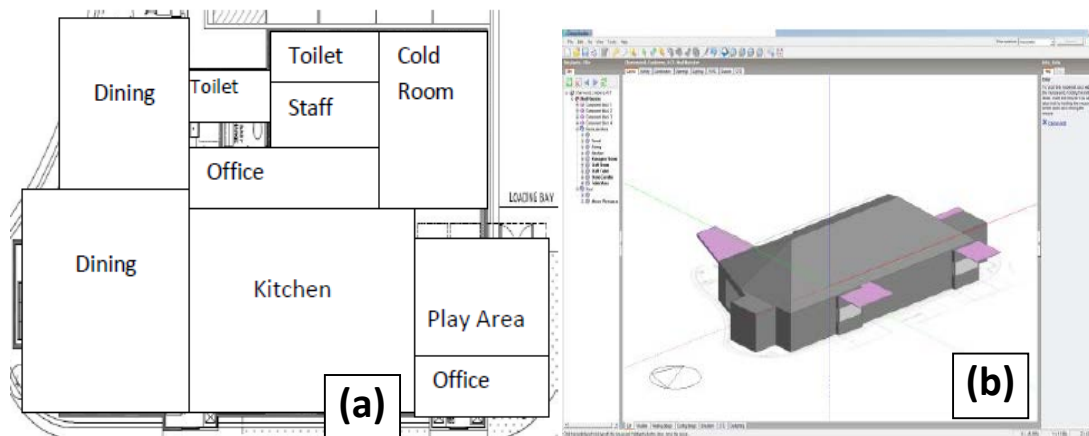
Floor plan (a) and 3D model of the single storey Restaurant building (b)
